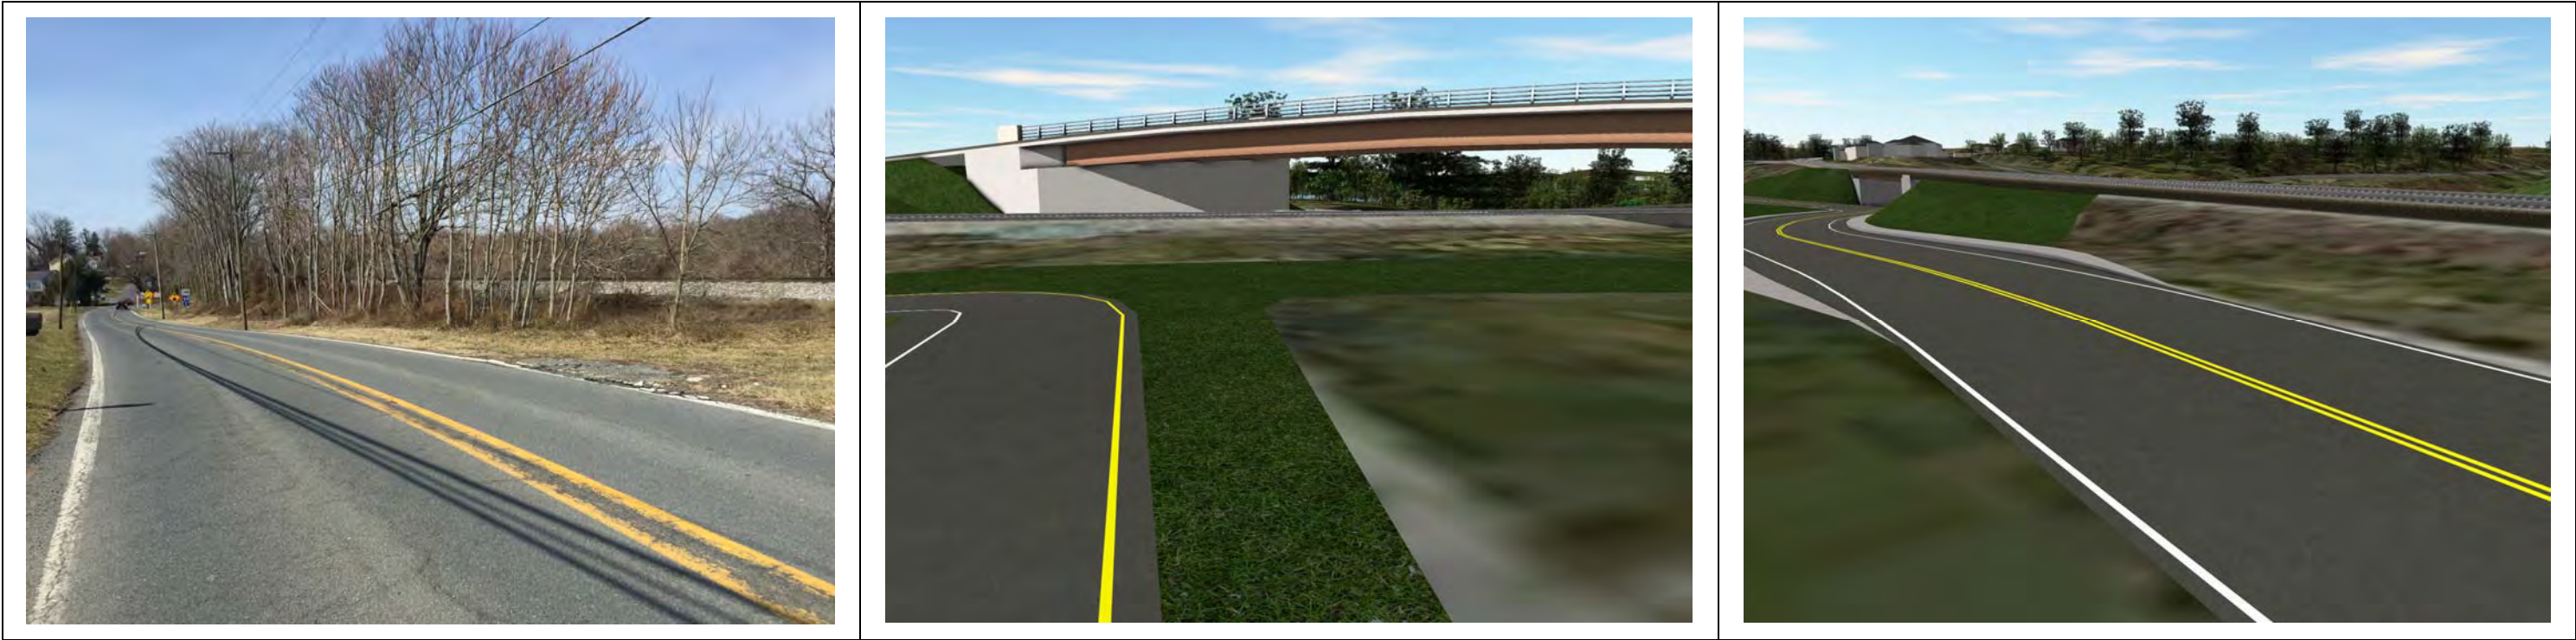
View from near 14920 Clopper Road. Left: Site photo looking west. Middle: Alternative 1 highway bridge, looking north. Right: Alternative 2 rail bridge, looking west.
